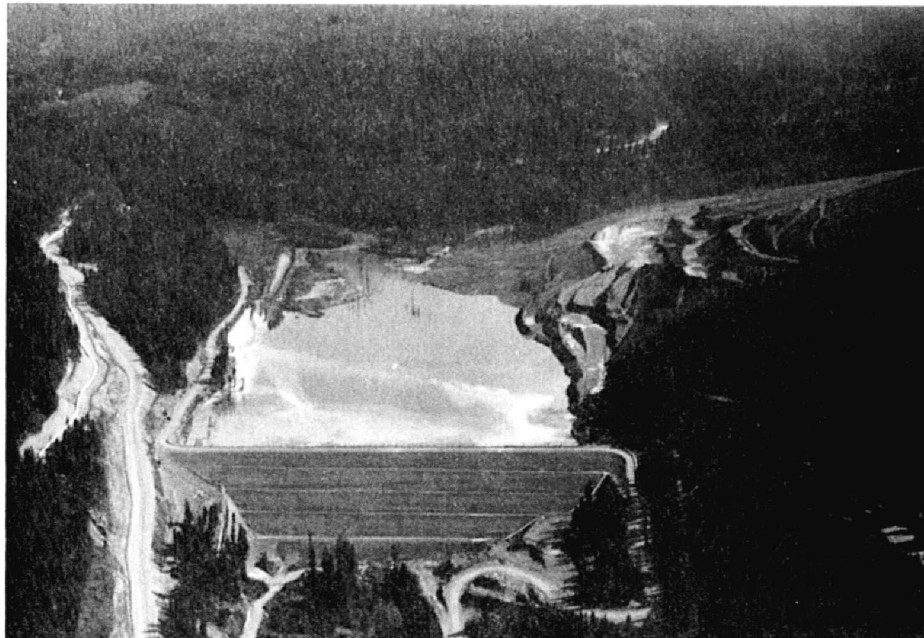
Aerial View of Zonolite Tailings Dam Looking Upstream
